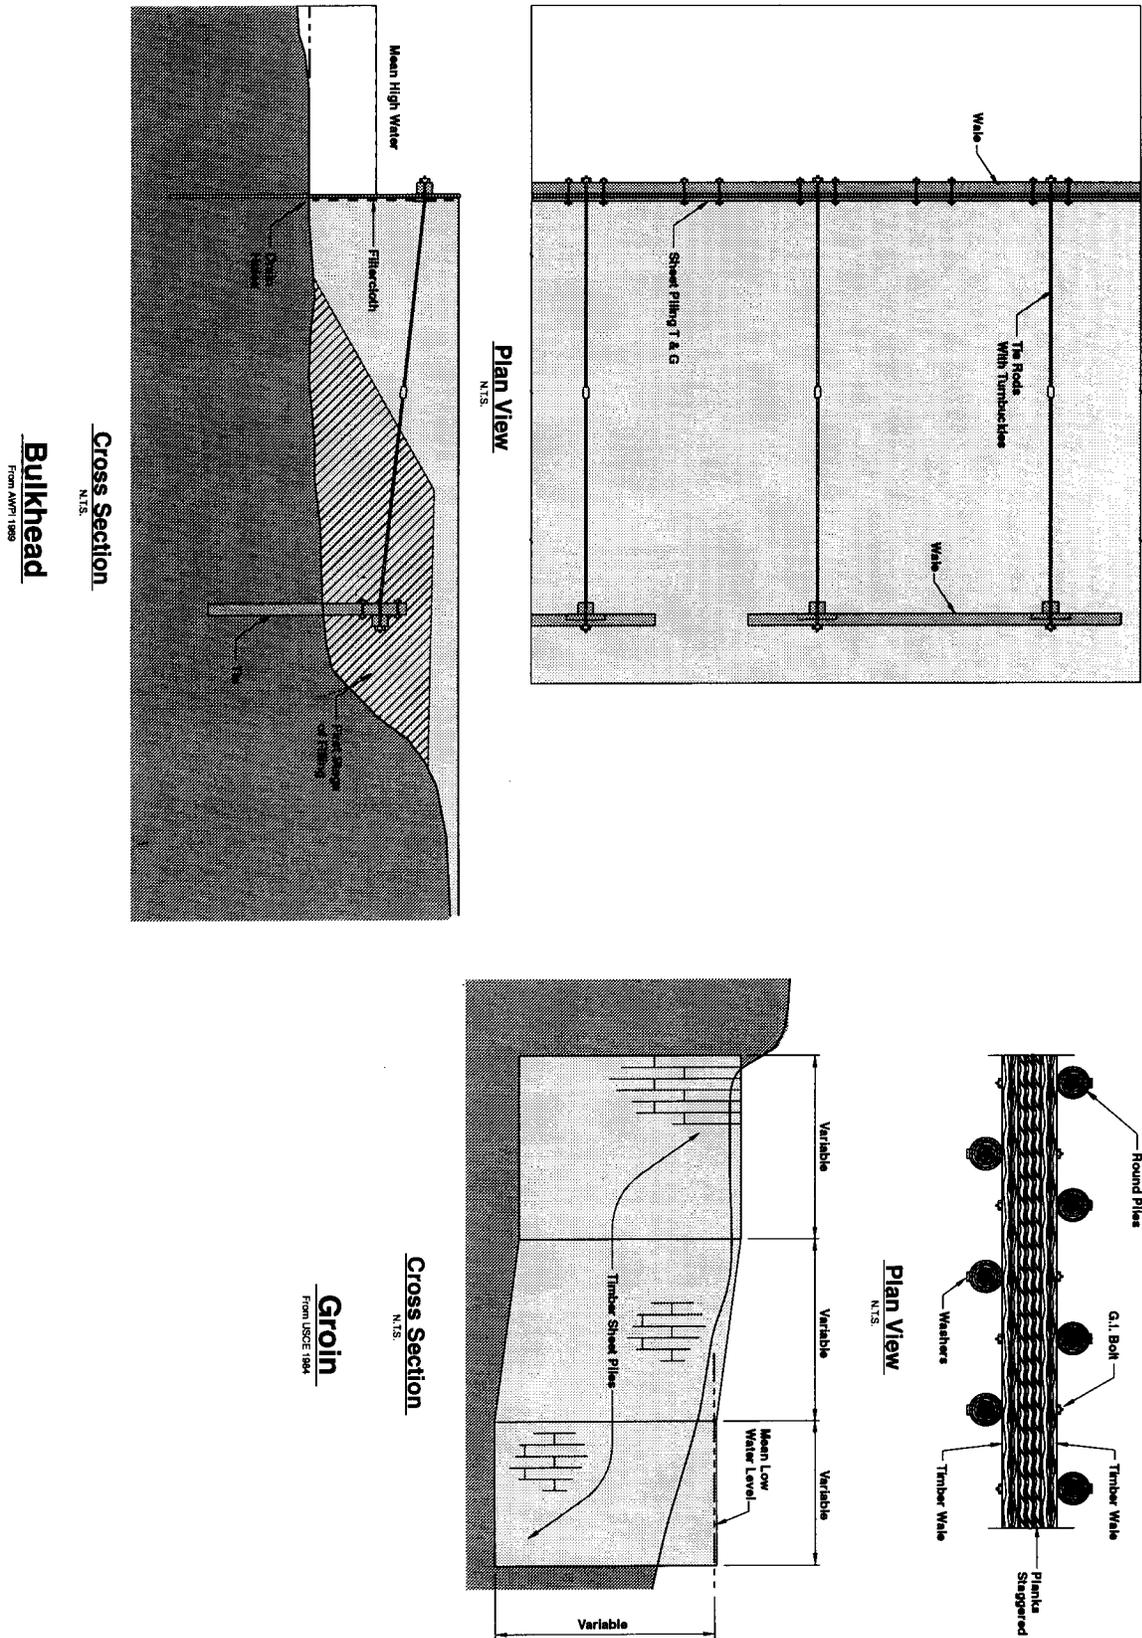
Wood bulkhead and groin: typical cross-sections and plan views. (After Reynolds and Hardaway, 1995)
